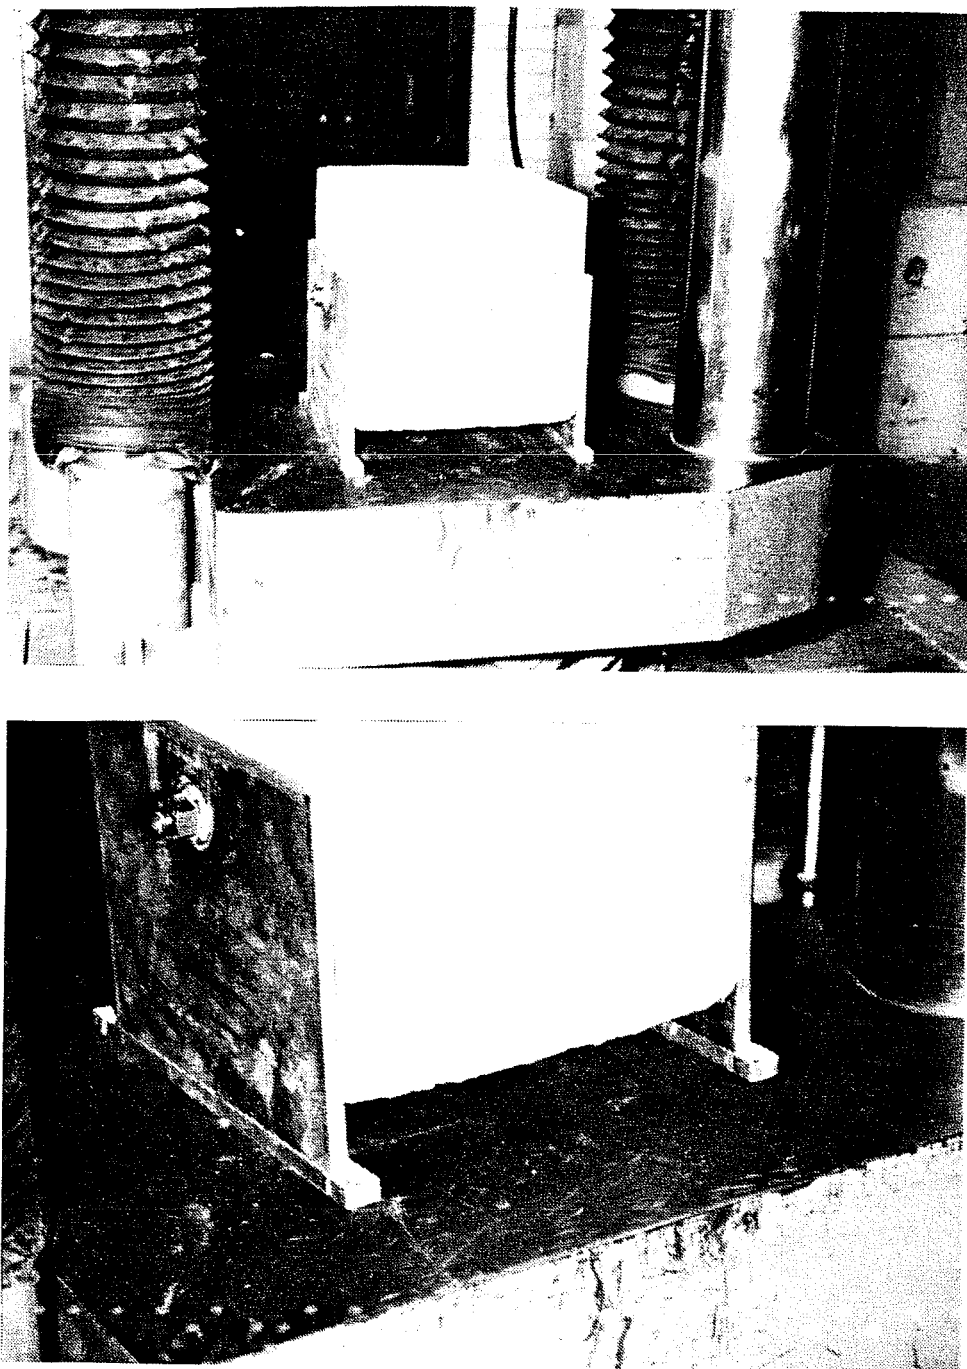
Specimen seated in aluminum channels and hydrastone
